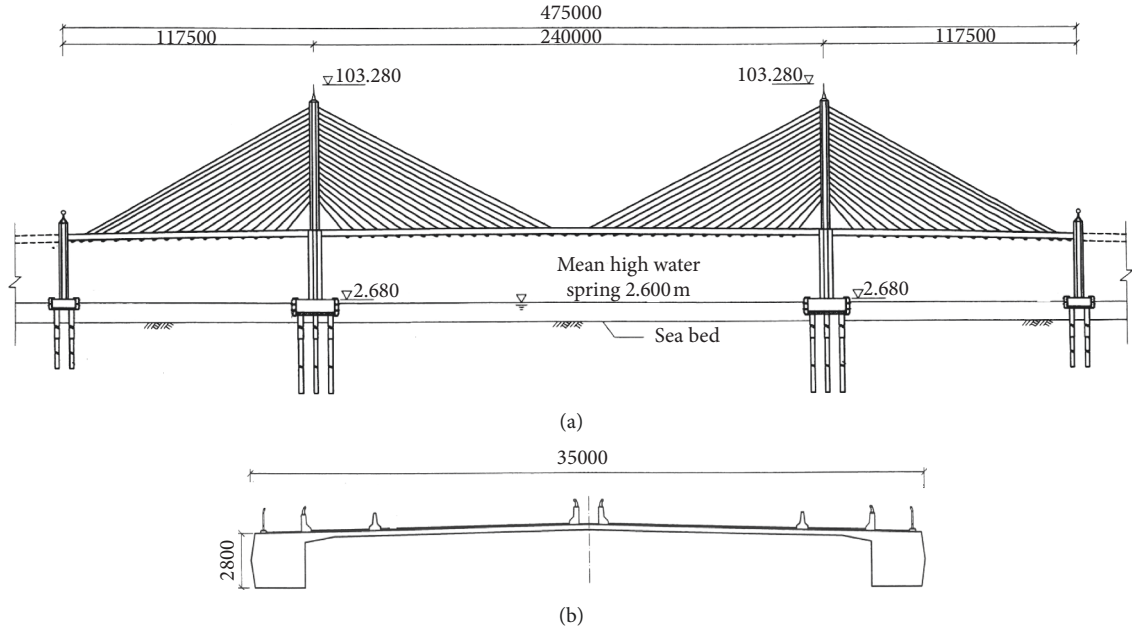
(a) Elevation and (b) cross section of a cable-stayed bridge.
